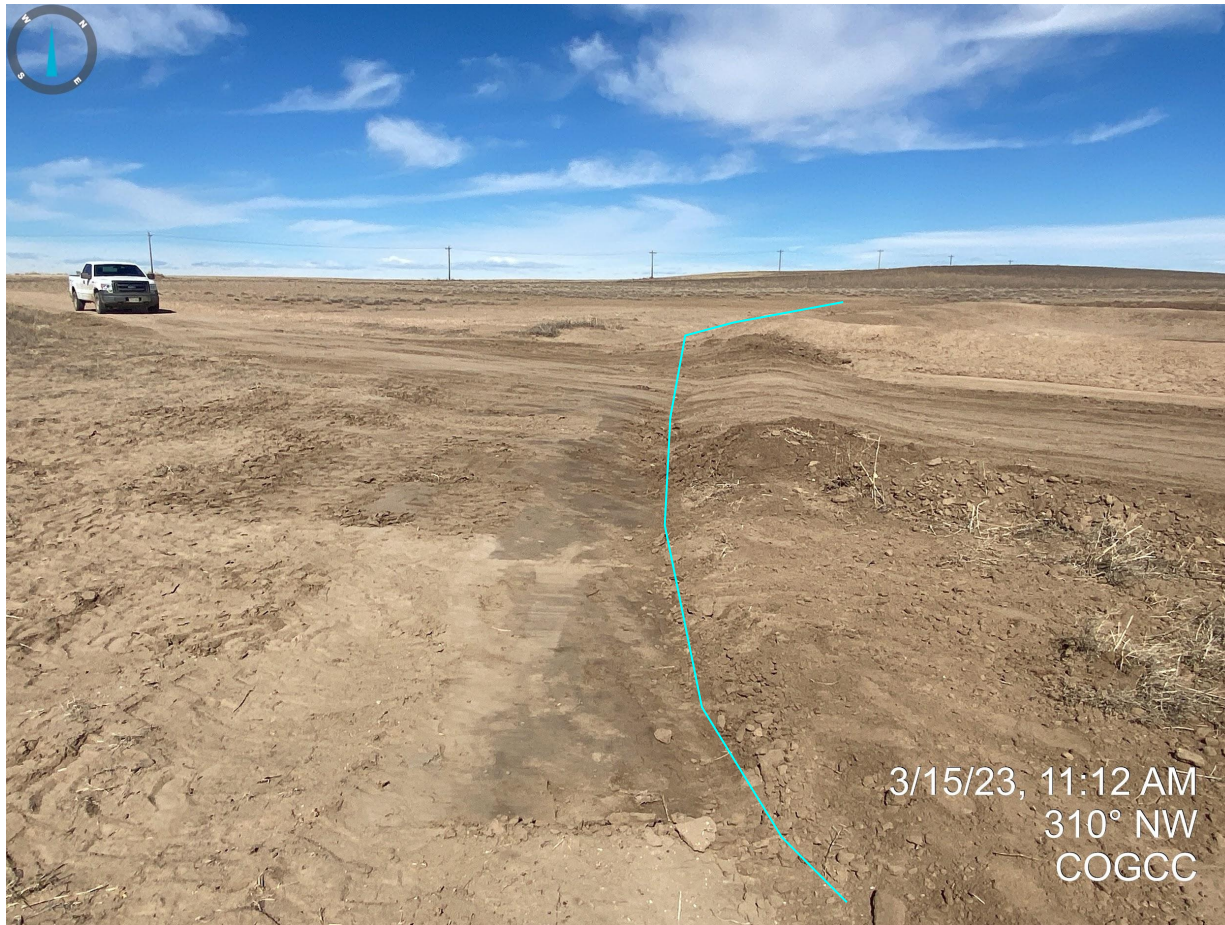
Facing northwest next to water bar/ditch. Blue line illustrates the potential path of stormwater; see comments in Photos 1 and 2 for additional detail.
